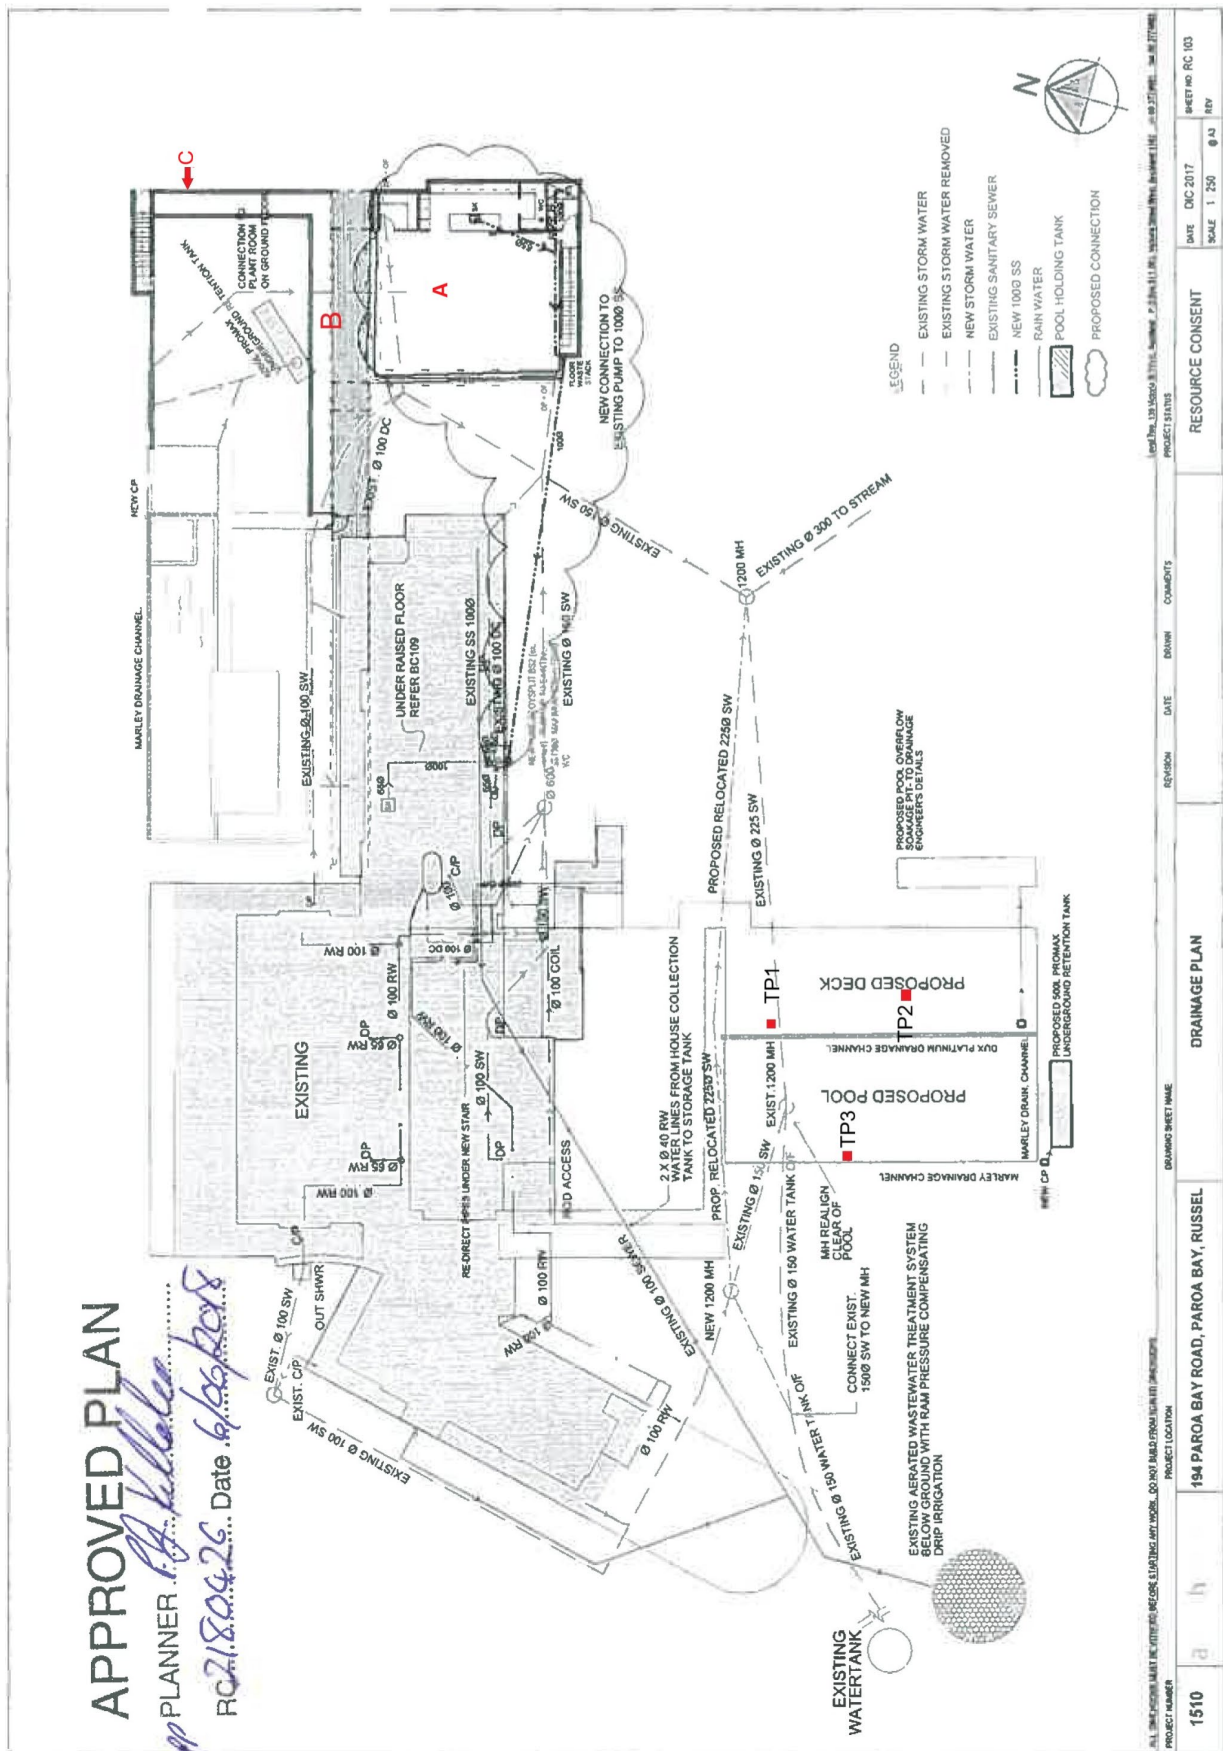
THE APPROVED PLAN RC103, SHOWING THE LOCATION OF THE PROPOSED GARAGE (A); WALKWAY (B); RETAINING WALL (C); SWIMMING POOL AND DECK (AND ASSOCIATED RETENTION TANK AND OVERFLOW SOAKAGE); AND THE LOCATION OF TEST PITS 1-3 UNDERTAKEN AS PART OF THE FIELDWORK ASSESSEMENT.
